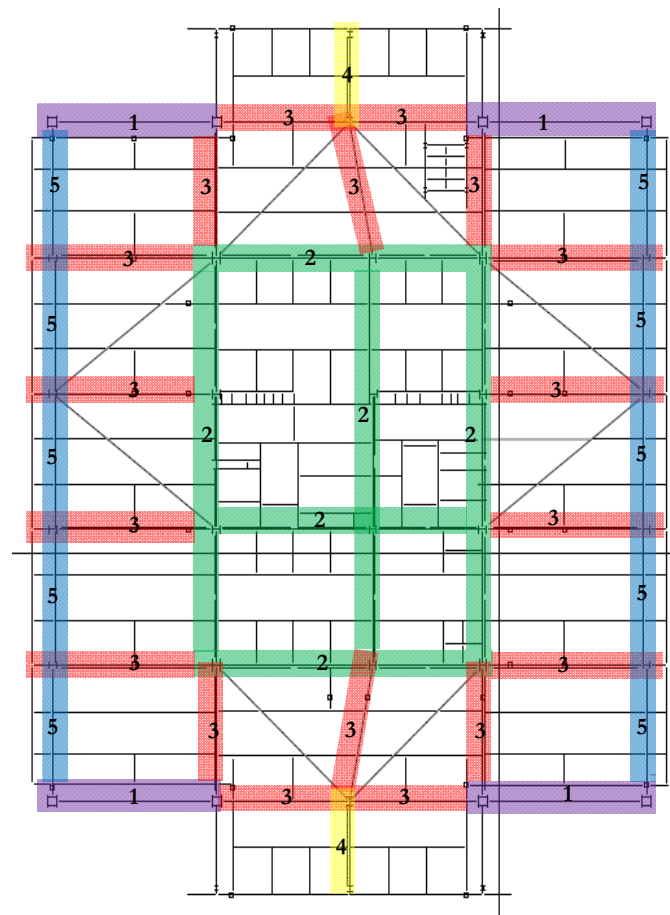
28th Floor Mechanical Floor Framing Plan
